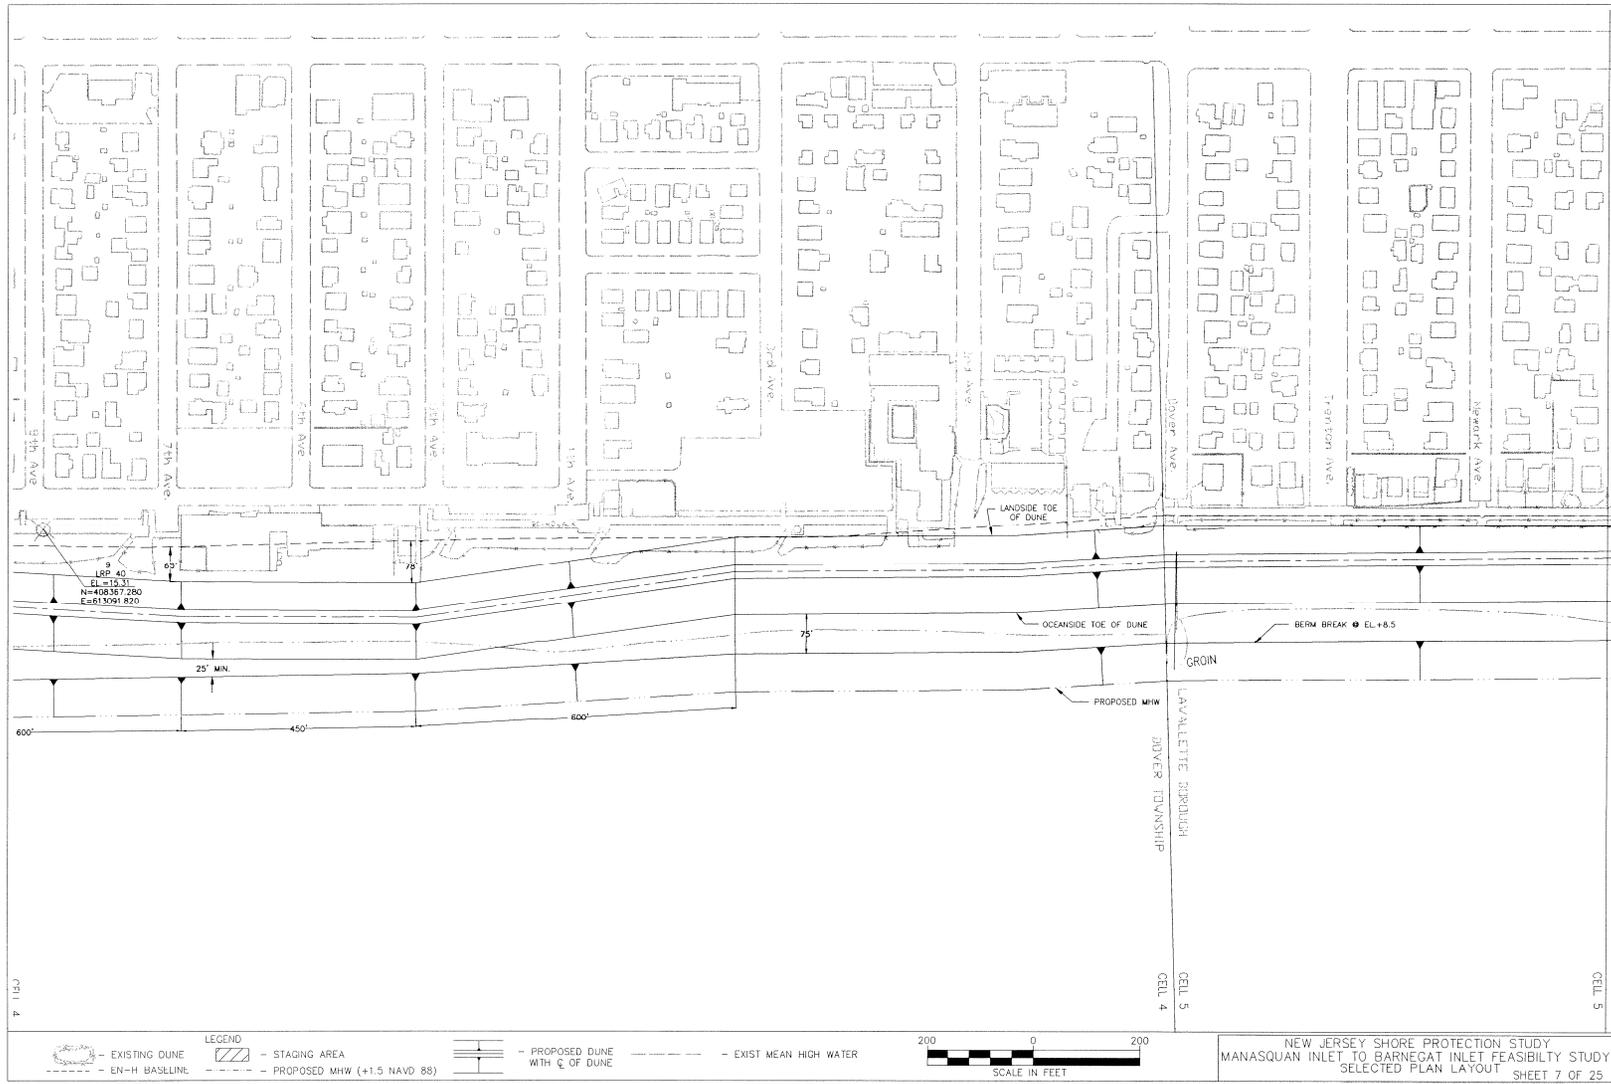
Selected Plan Layout – Dover Township, Ortley Beach to Lavallette Borough, Newark Avenue
